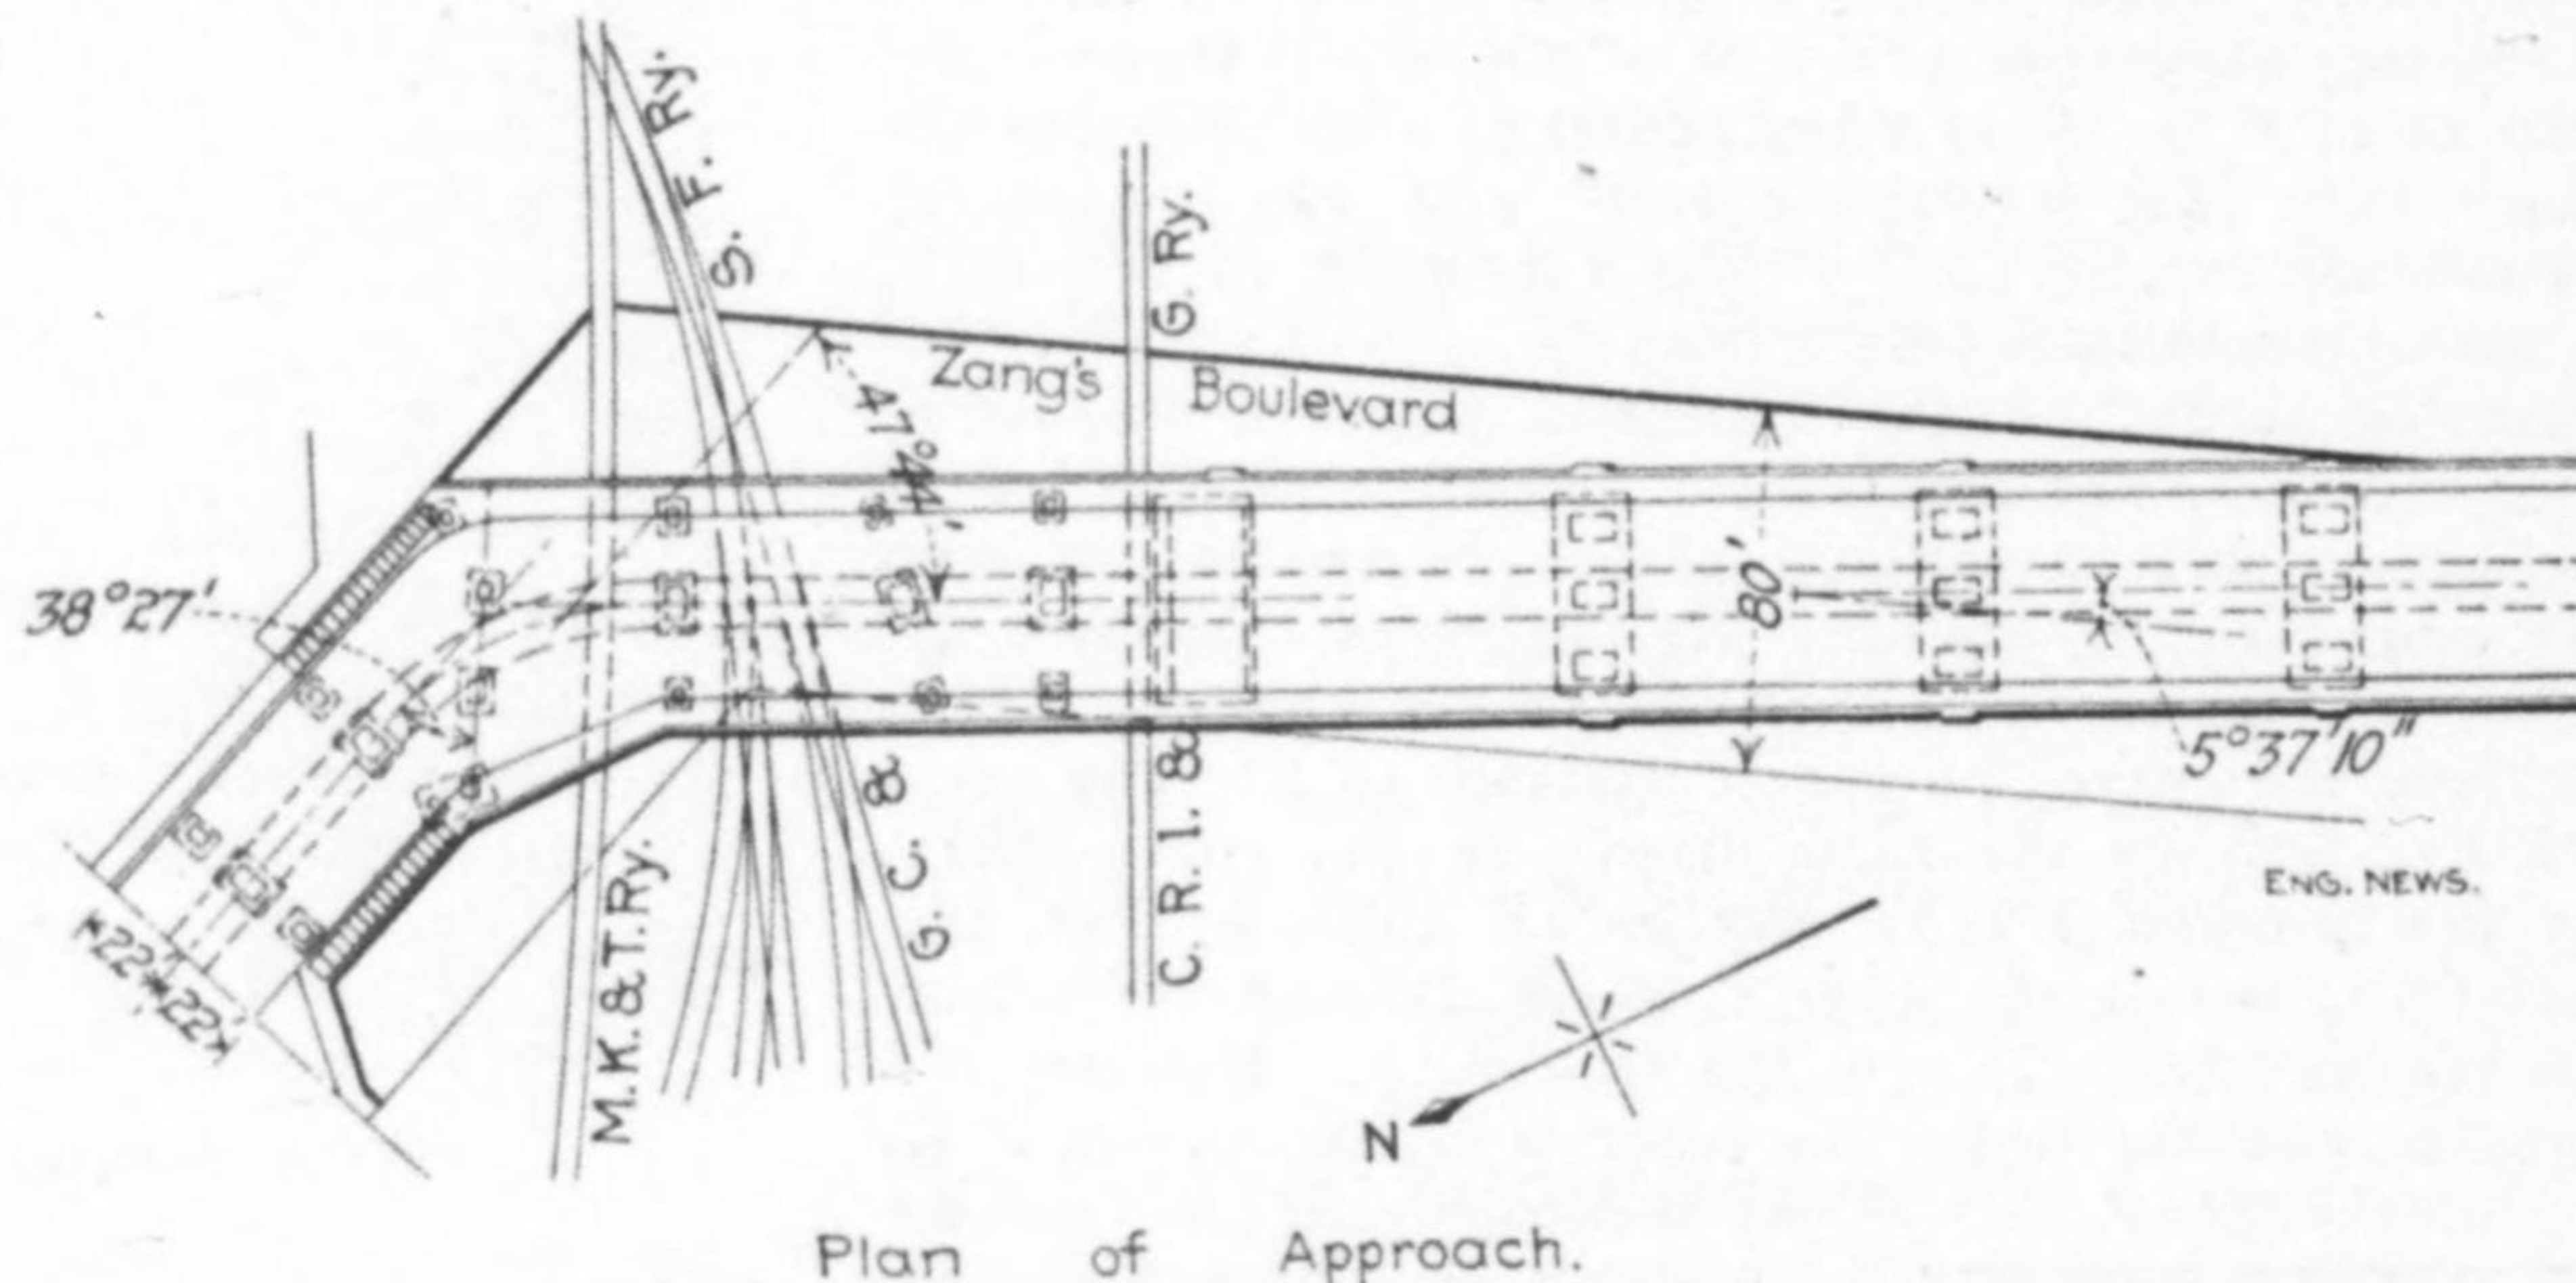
PLAN OF DALLAS END OF VIADUCT.
